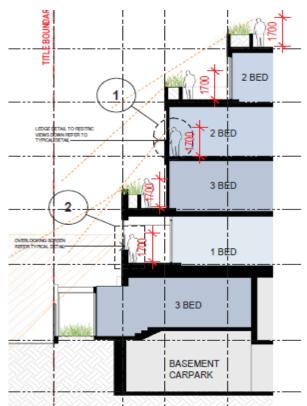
The balcony noted with 'number 2' in the diagram shows a south facing dwelling which has the balcony completely covered by an upper level balcony.
